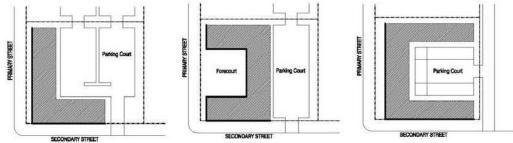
TOWNHOUSE BUILDING TYPE 1
